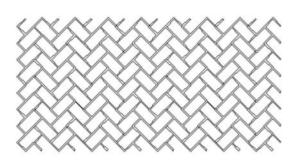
Typical Diagonal Herringbone Layout for Inter Locking Block Installation
